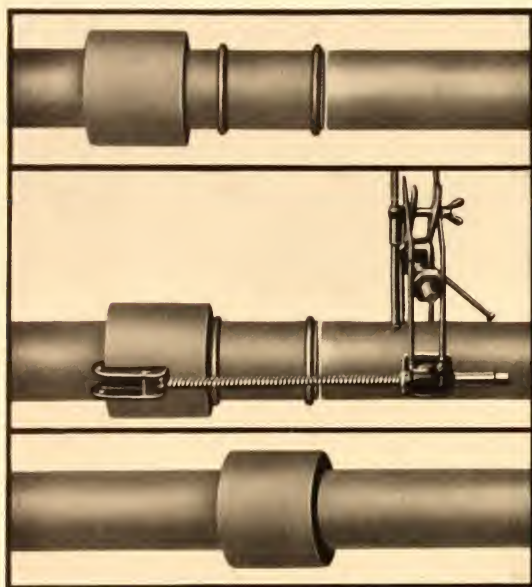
ASSEMBLING SIMPLEX JOINT USING JOINT MOUNTING TOOL
